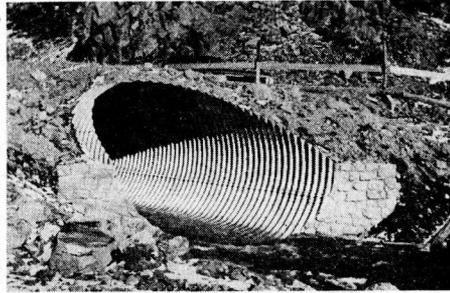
Entrance to Multiplate Culvert With Skew and Miter Cut. There is no general justification for either skew or miter cuts for metal pipe or multiplate culvert.
